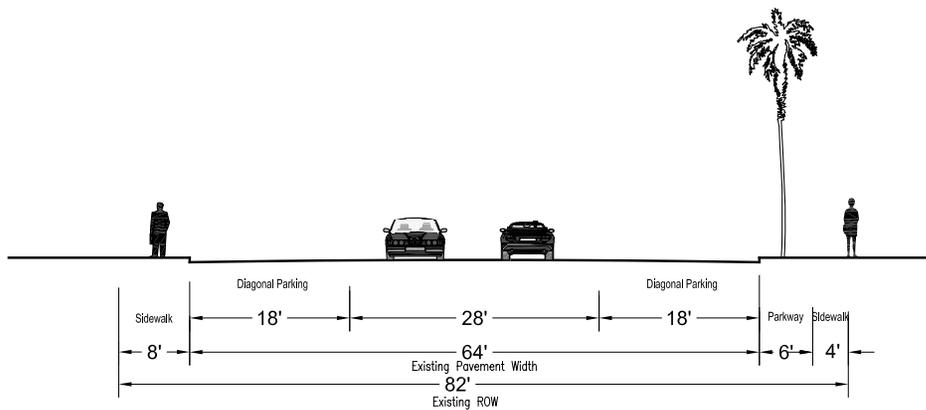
TYPICAL SECTION - 3RD STREET
